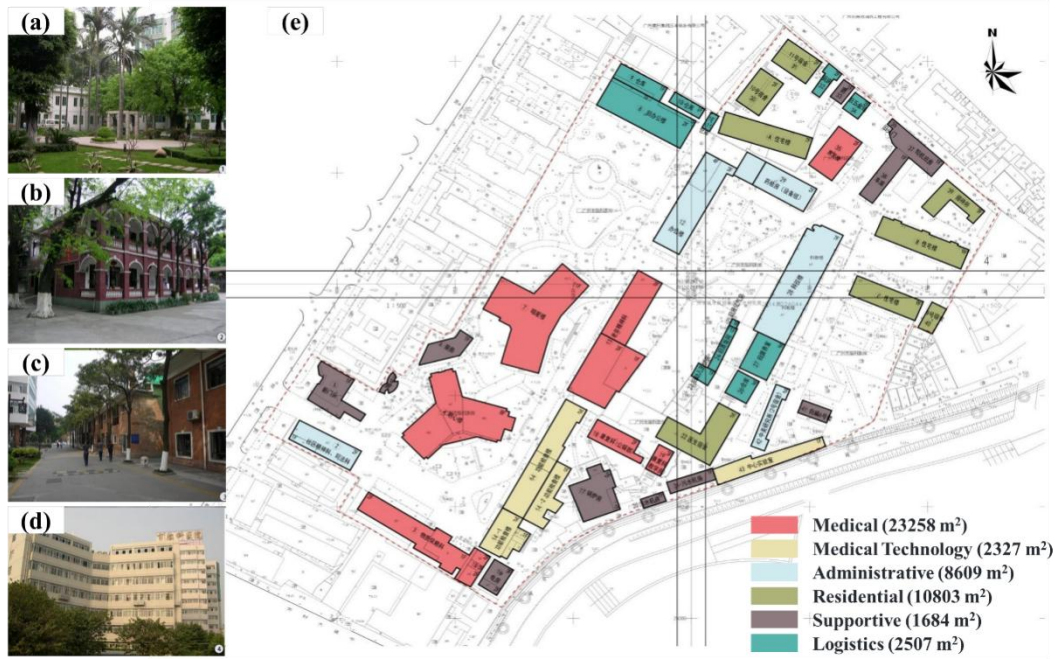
Current building layout of Huiai Hospital in Guangzhou
